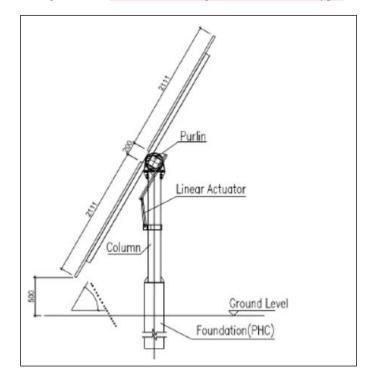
6 Layout of Horizontal Single-axis Bracket
